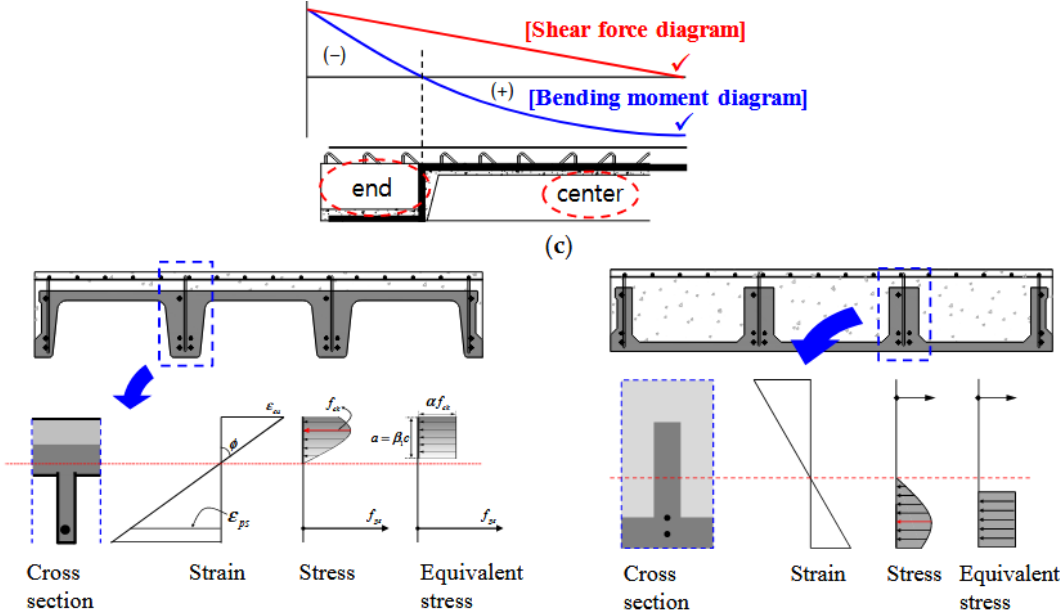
Optimised-section precast slab (OPS) - stress distribution in the centre and end section [72]
